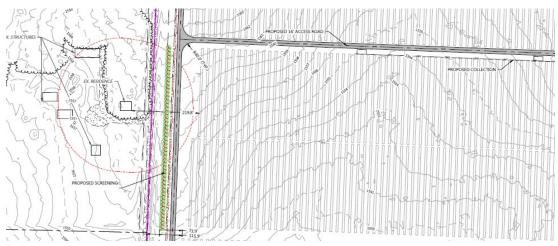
PROPOSED LANDSCAPING / SCREENING AREA PLANTING PLAN
